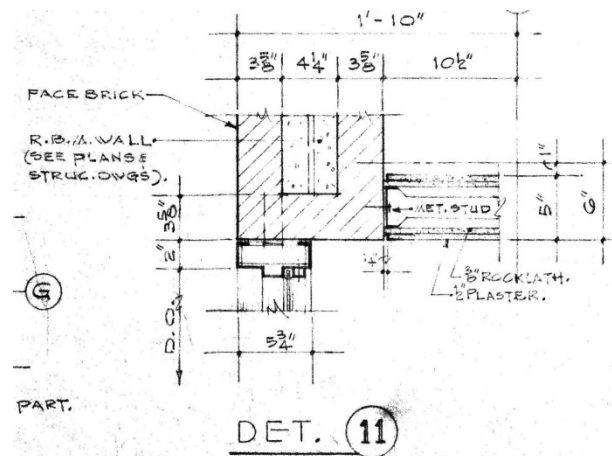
Detail of existing steel frame to reinforced masonry jamb. [From 1968 Drawing A-19]
